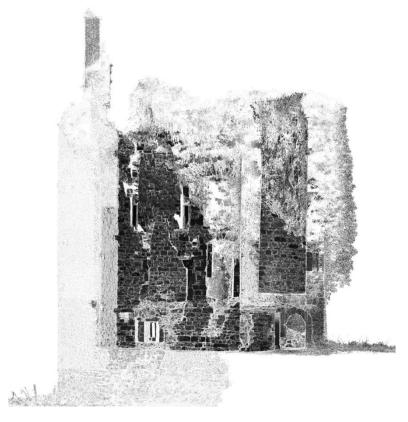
Cross section through the Northwest tower (looking Southwest) displaying the level of architectural detail recorded in the pointcloud.
